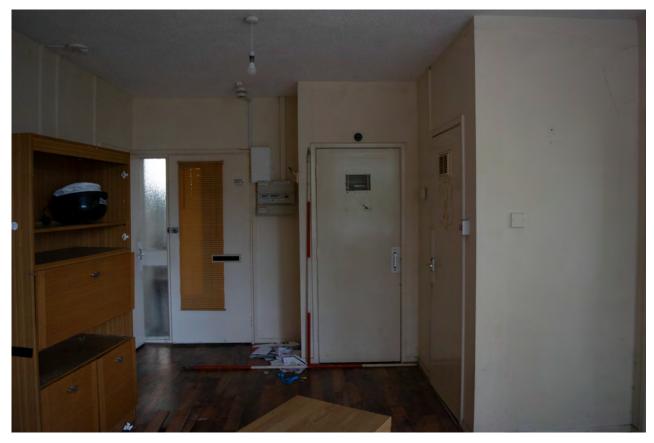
North-west facing wall of living room in flat 3. 2x2m scale.
